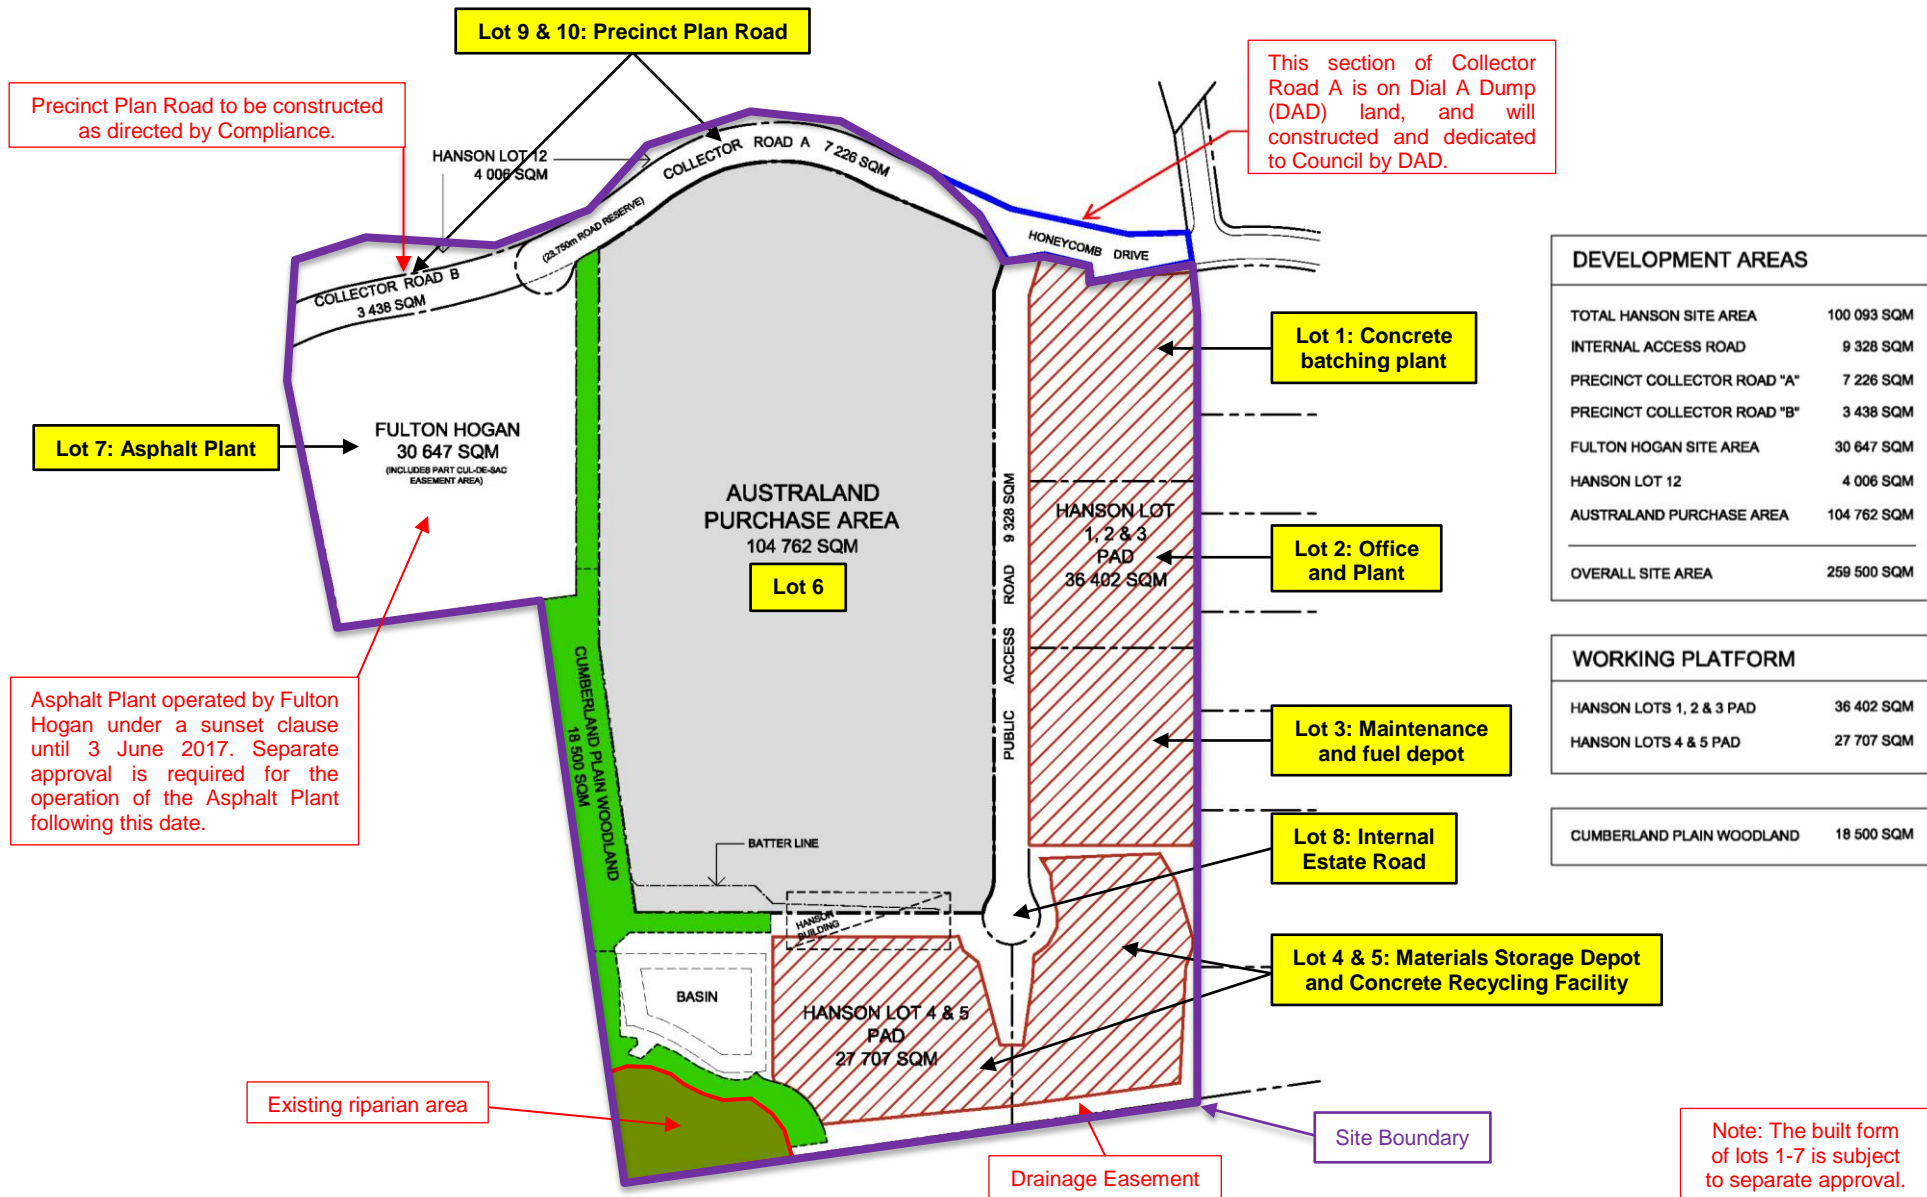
Proposed modification to the Concept Plan (Fraser's, 2016).
